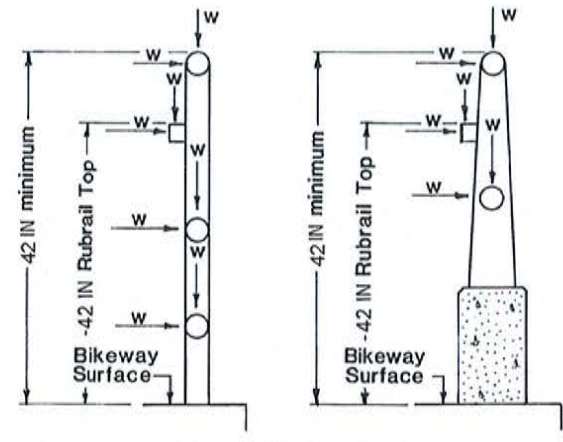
Bicycle Railing Loads—To be used on the outer edge of a bikeway when highway traffic is separated from bicycle traffic by a traffic railing. Railing shape illustrative only.
